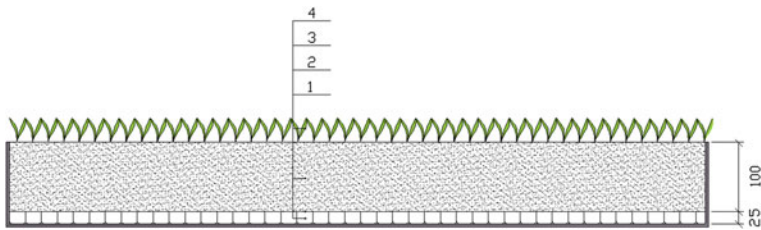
Construction of the experimental module 1 water-retaining/drainage board (25 mm), 2 geotechnical fabric (1 mm), 3 lightweight planting soil (100 mm), and 4 *Sedum lineare* (40 mm)
